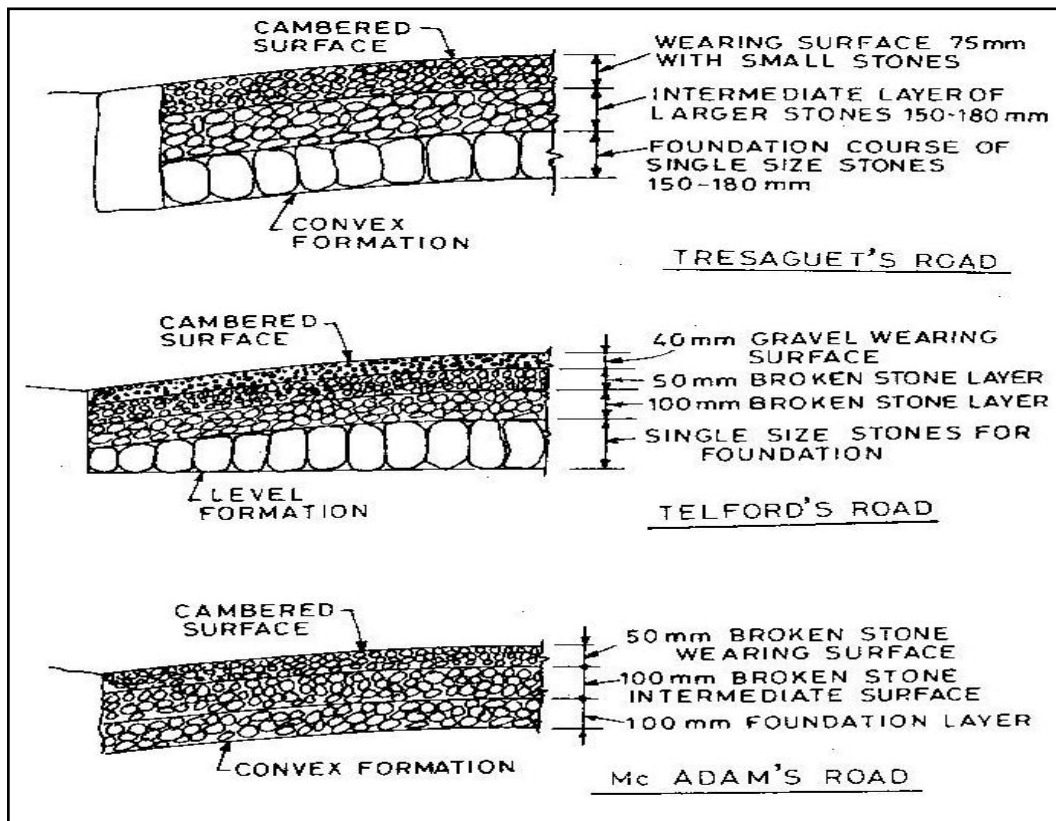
Cross-Sections of Some of the Early Roads. (Kadyali and Lal,2008).
